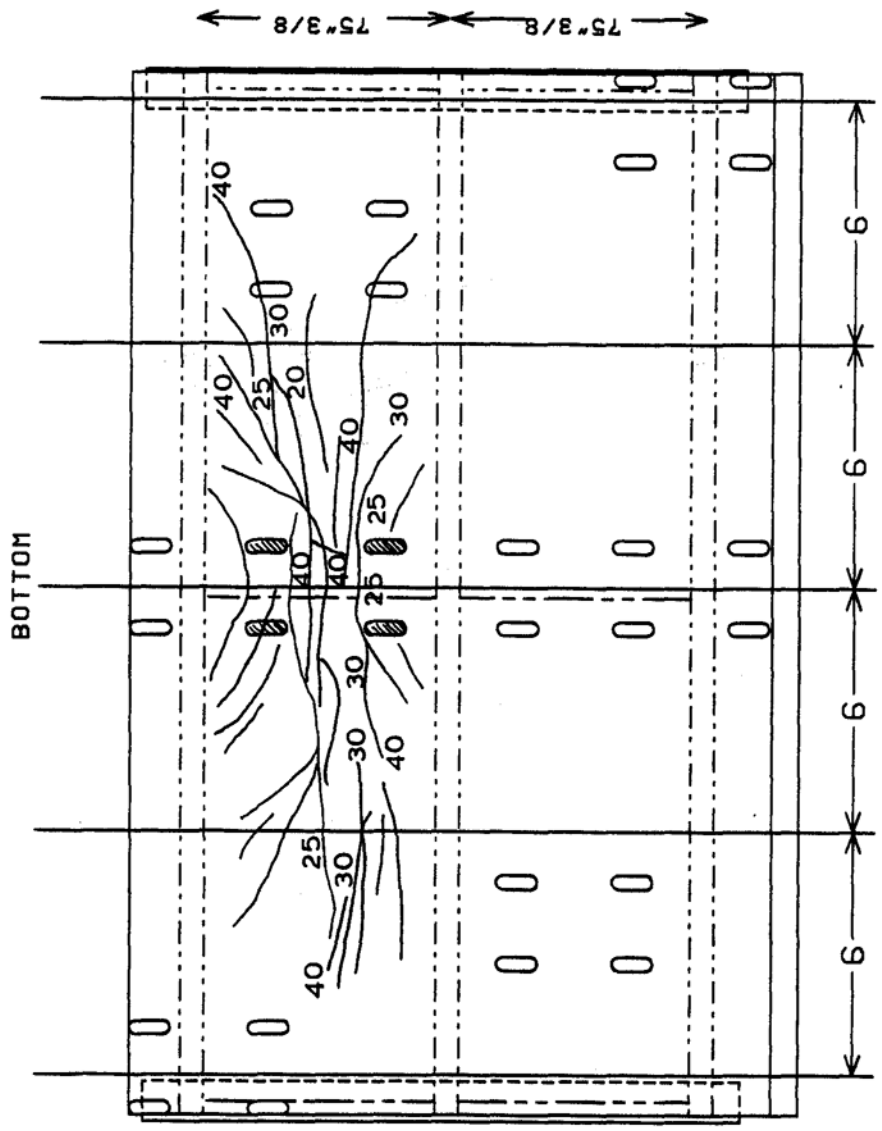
Bottom Cracking Pattern (Second Bridge - Test No. 1)
